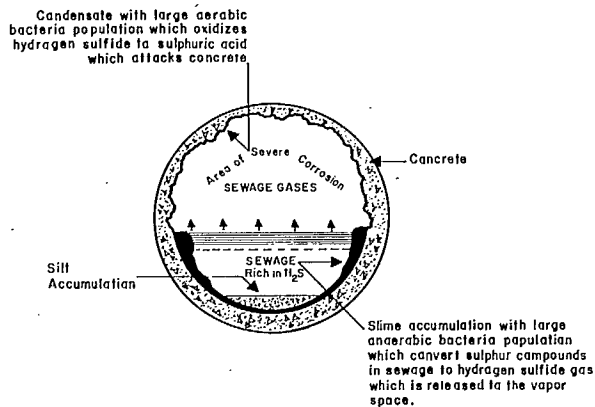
Cross section of concrete sewer pipe under typical corrosive conditions; from reference 58
